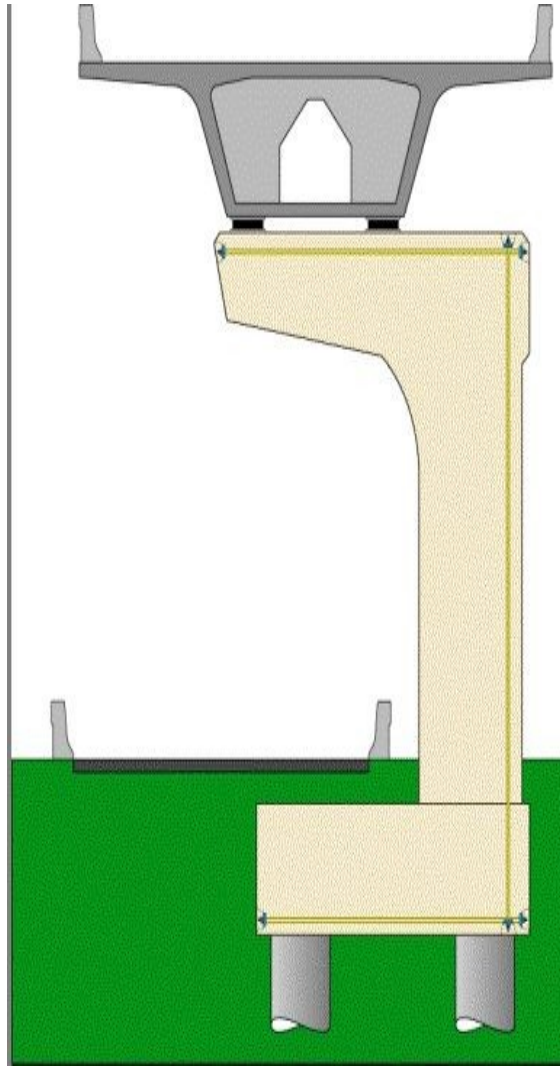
Post-Tensioning in Cantilever Piers.
